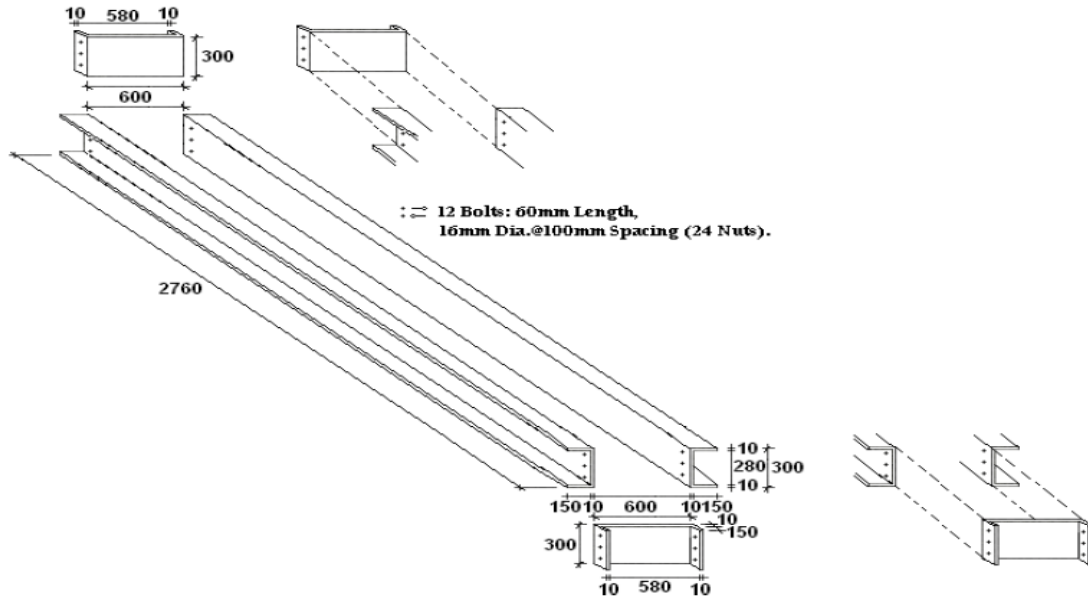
Typical Steel Shutters used for the Beam Specimens in Test-Series "1".
